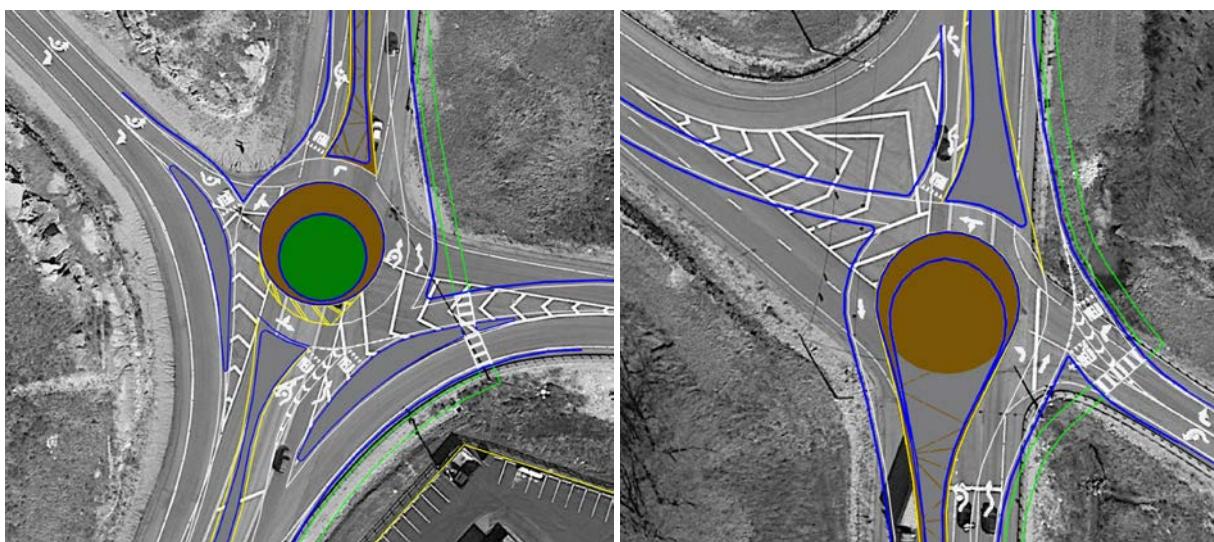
Build Concept with Roundabouts at Southbound (left) and Northbound (right) Ramps
